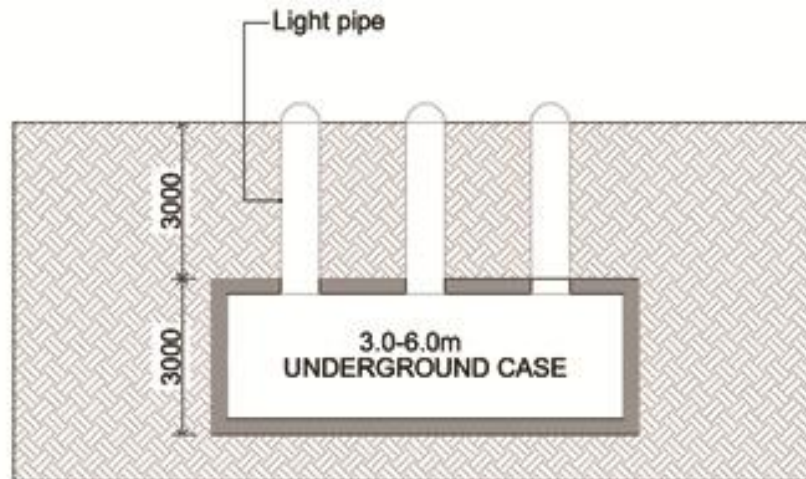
Shows light pipe installed in 3-6m underground space (Author)
